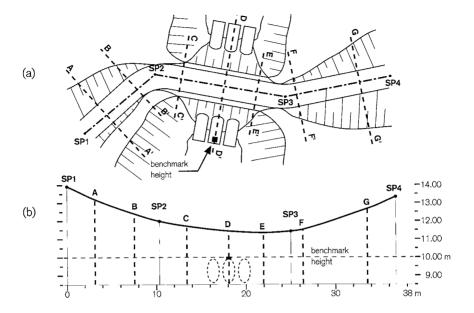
(a) Imaginary site map of a road crossing a streamlet via a dam with three culverts; dotted lines indicate one longitudinal section (SP1-SP4) and seven cross-sections (A-G). (b) Longitudinal section SP1 - SP4. For cross-sections A-G; see Fig. 5.
